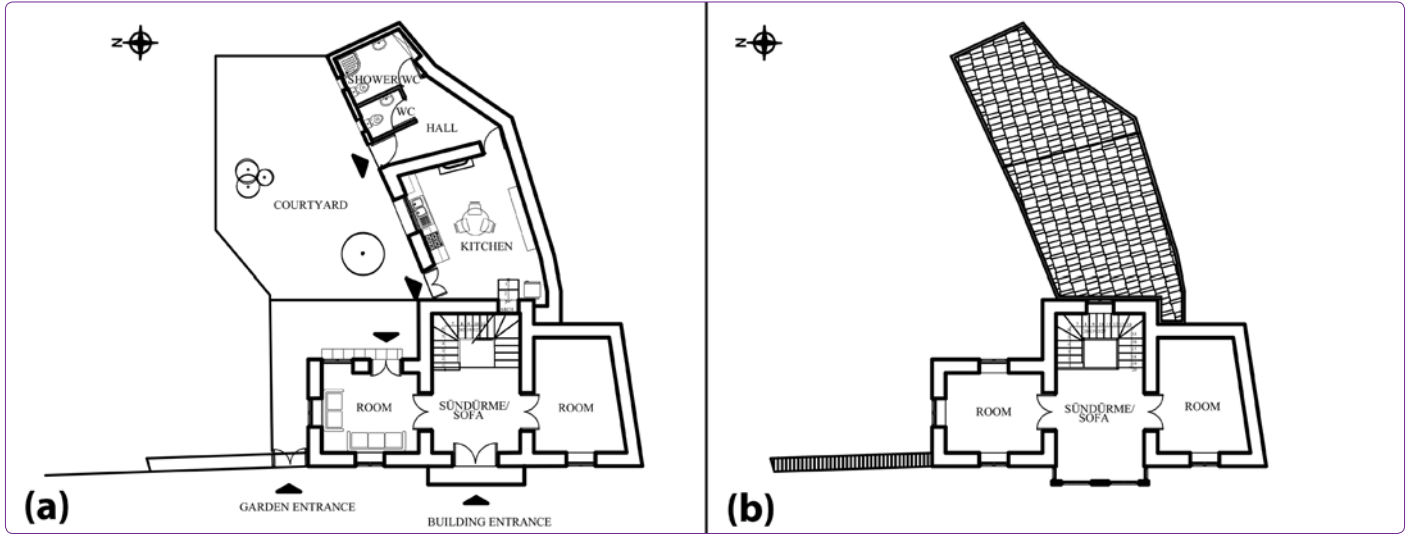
(a) Ground floor plan. (b) First floor plan. Source: Makbule Oktay, December 2018.
